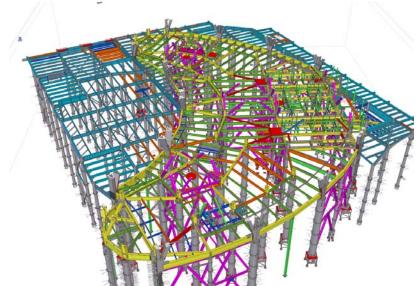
This fabricator's drawing of the ground floor and basement framing of the Bow Encana Tower in Calgary, AB, Canada shows some of the complexity that can be handled easily by detailing software. Each connection is fully designed including bolting and welding information as responds to load calculations. The colors are indicative of function and construction sequence.³
